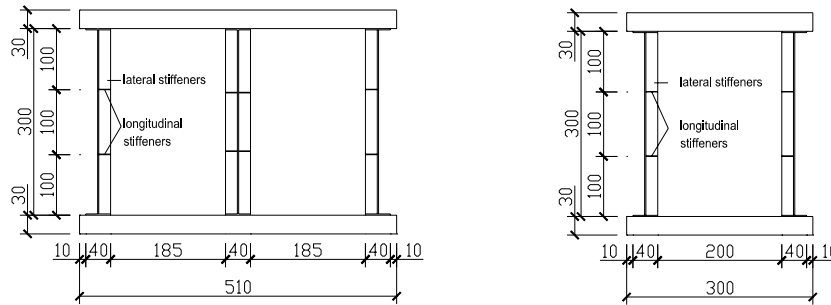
Cross section of tied beam with planar steel webs (unit: cm)
